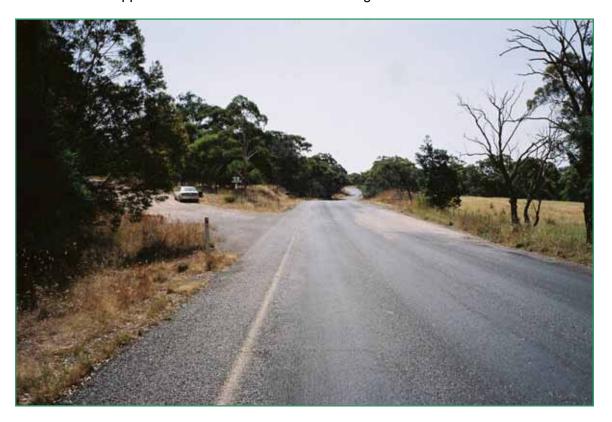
Cullerin Road - Old Sydney Road junction.
